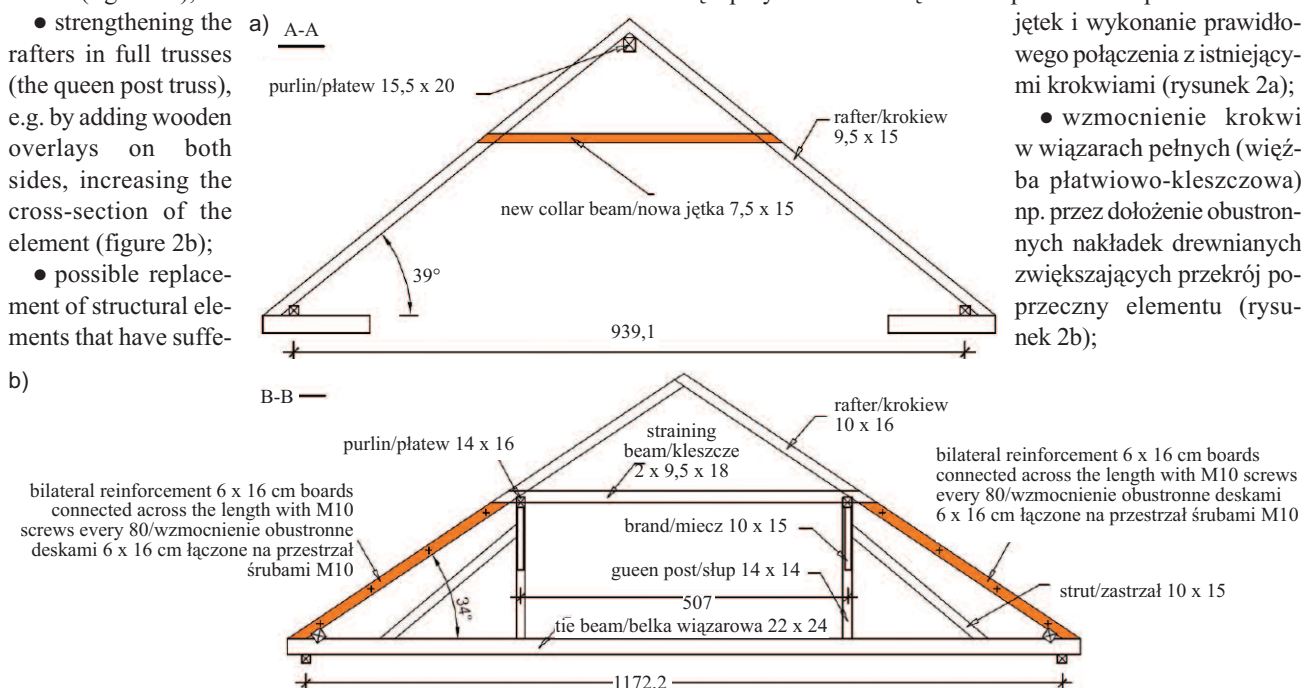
Strengthening of roof trusses: a) type 1 truss over the presbytery; b) the queen post truss
